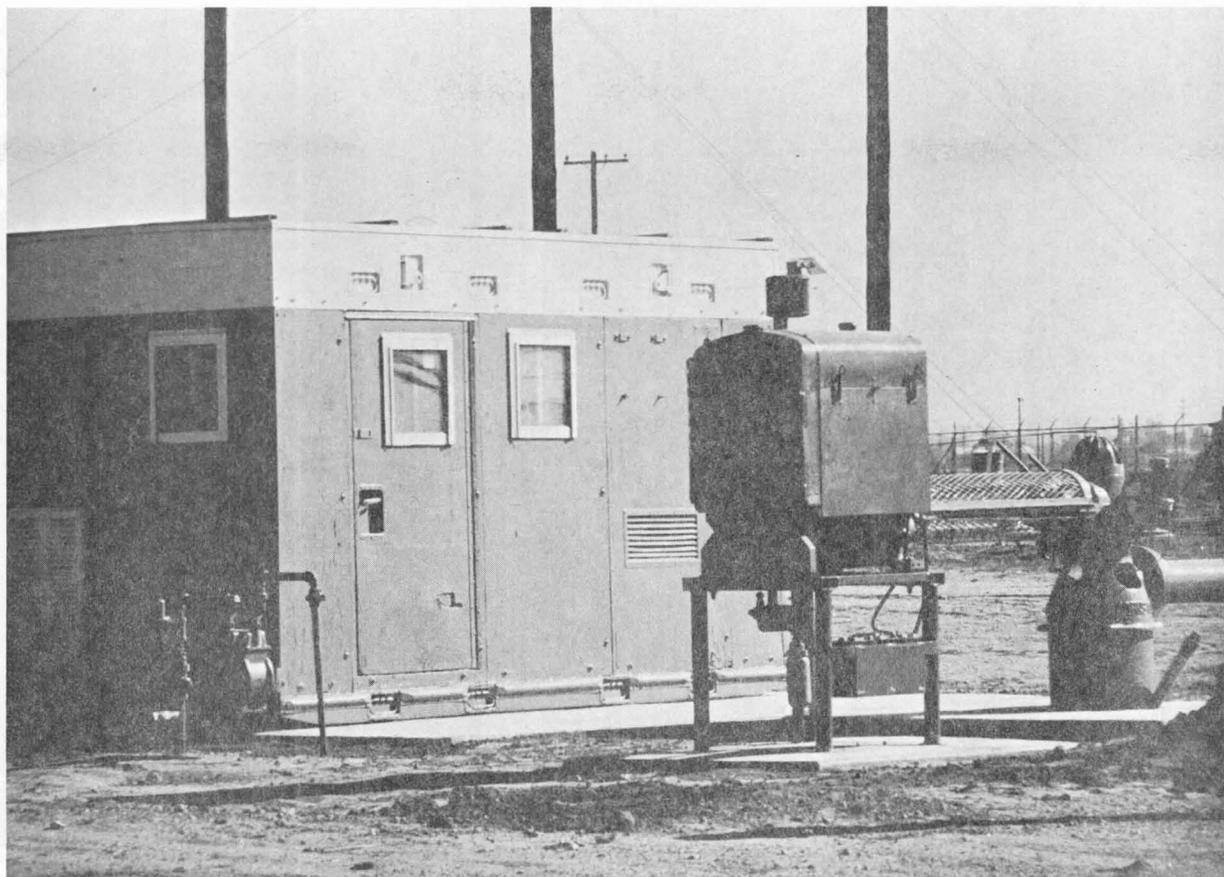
16-INCH PUMPING WELL USED DURING "TWO-WELL" TESTS AND INSTRUMENT SHELTER
